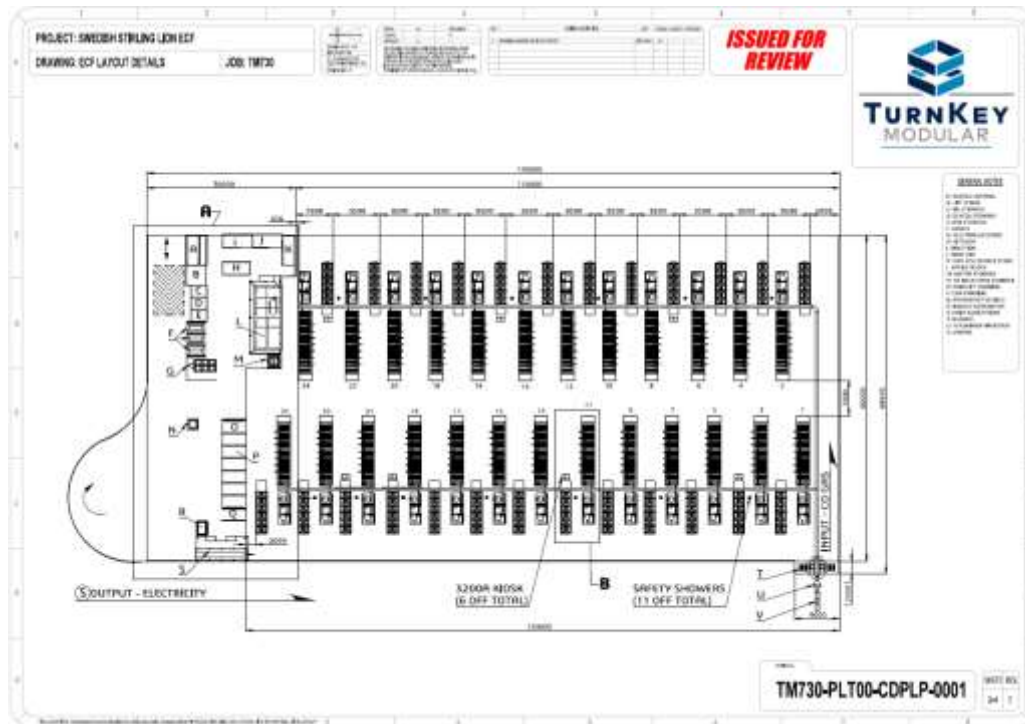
Site layout plan (Swedish Stirling, 2021)
